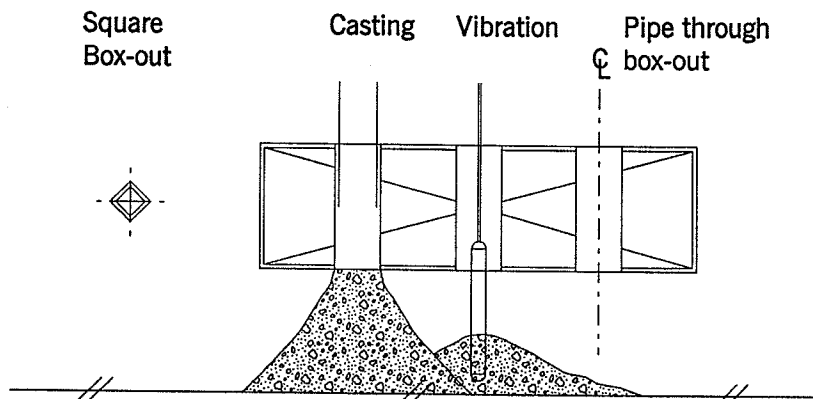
Box-out in the same wall but placed 500 mm above the casting joint
